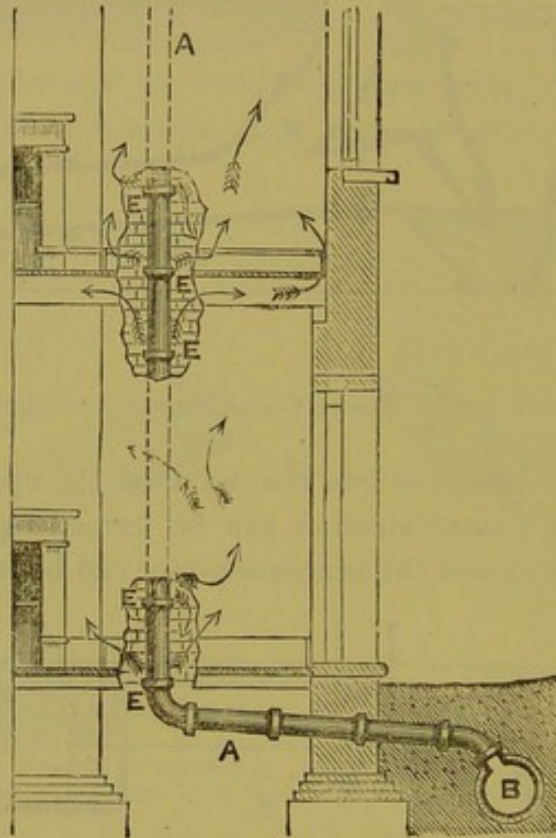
Drain-pipe ventilating the Drain through the House!
